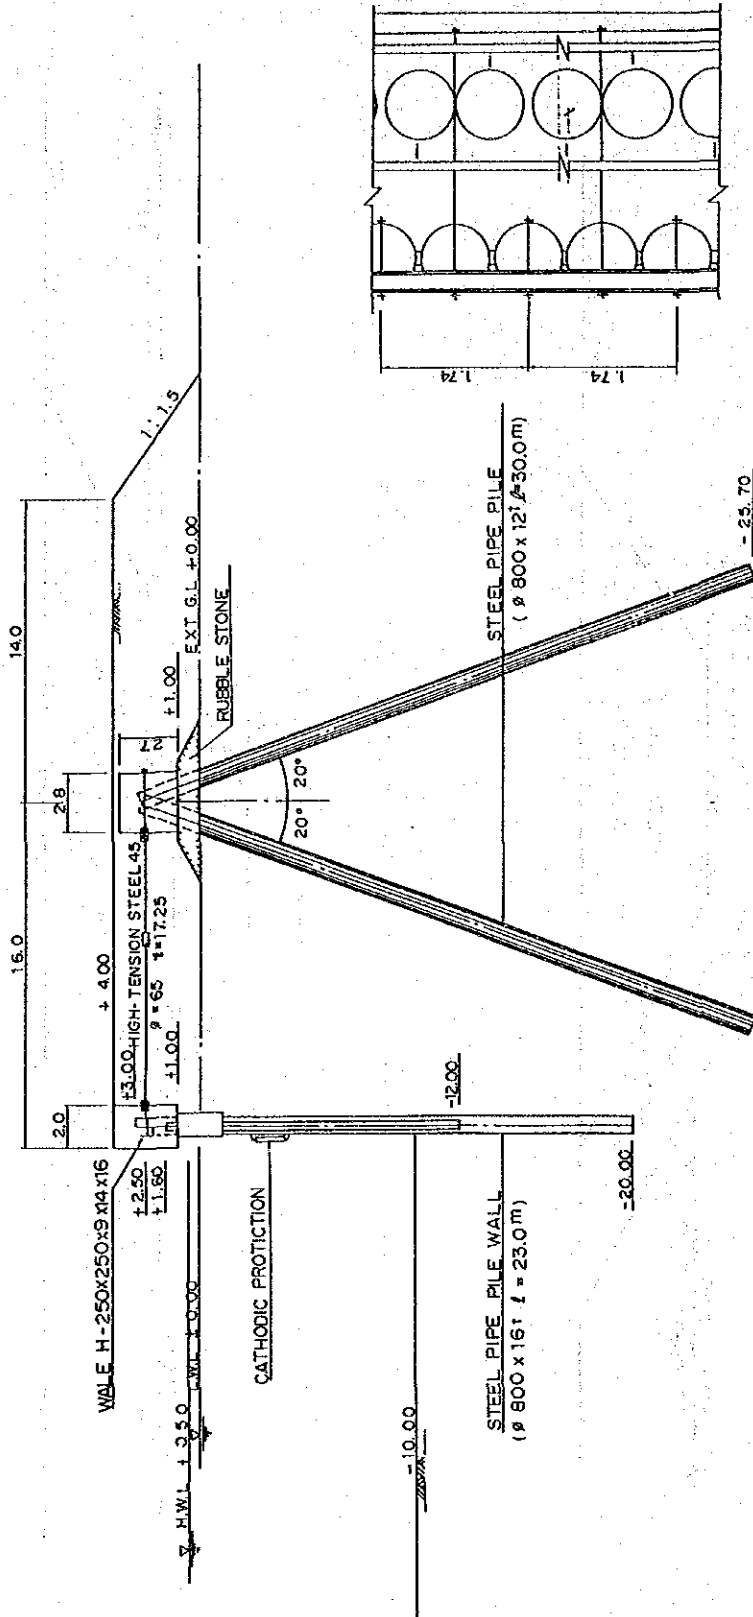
(A-s) ㉔ REVETMENT (FOR ROAD) (PLAN B) (Unit; m)
